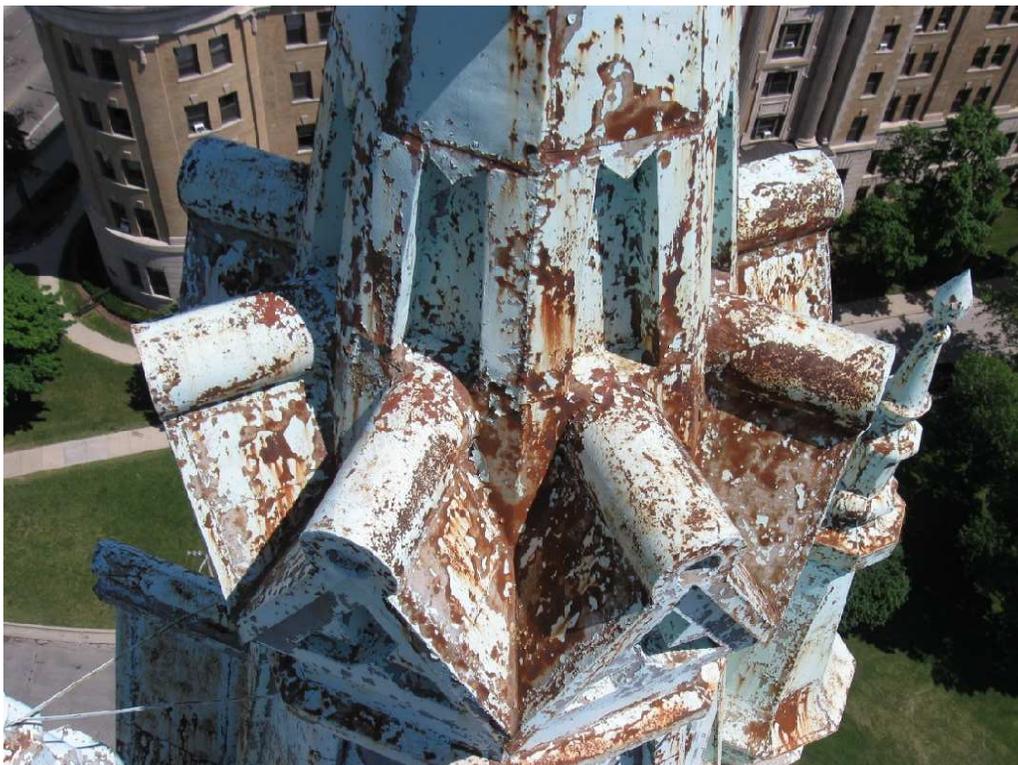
View from SE corner showing access hatch on the east face of roof.
